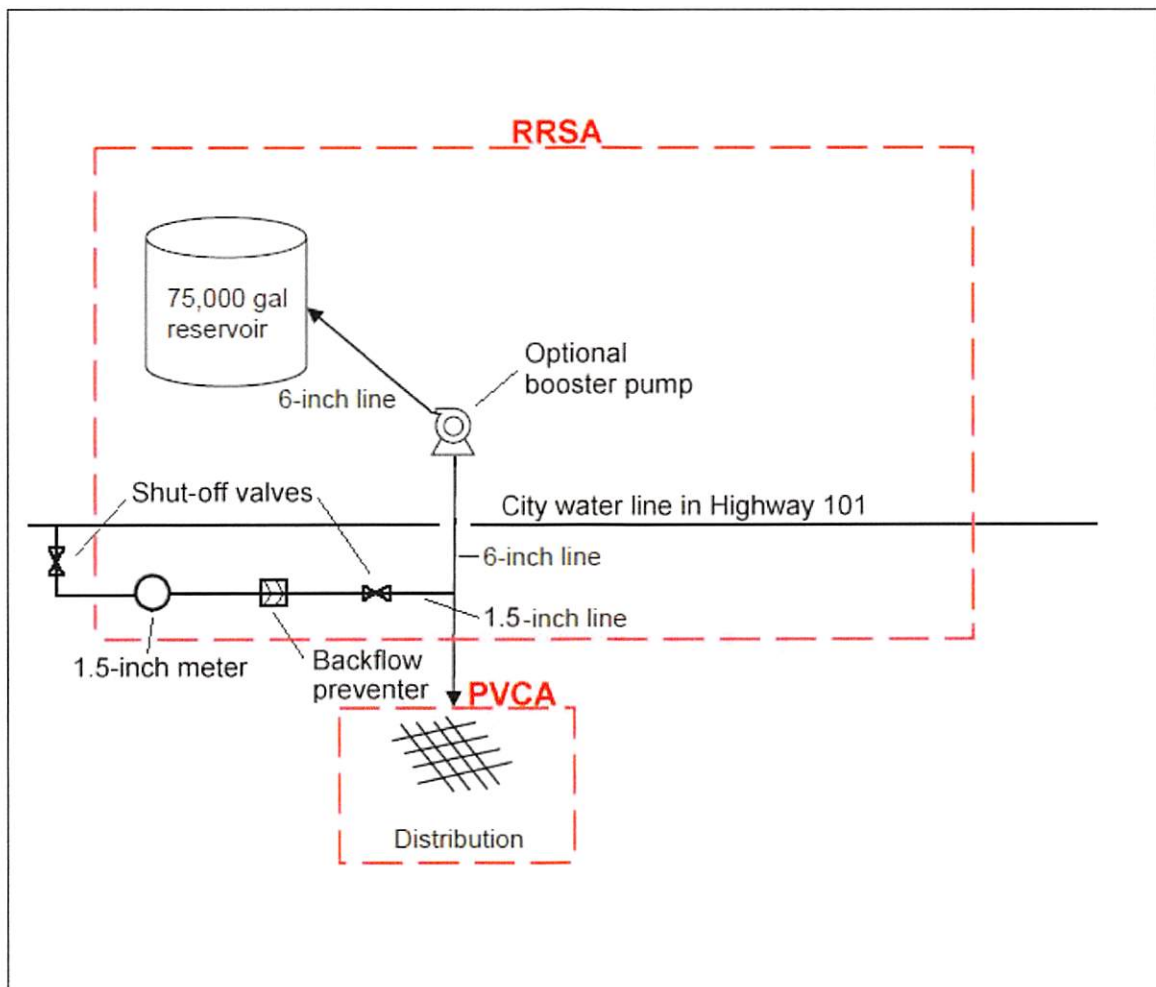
Conceptual Layout for RRSA Connection to City Water
